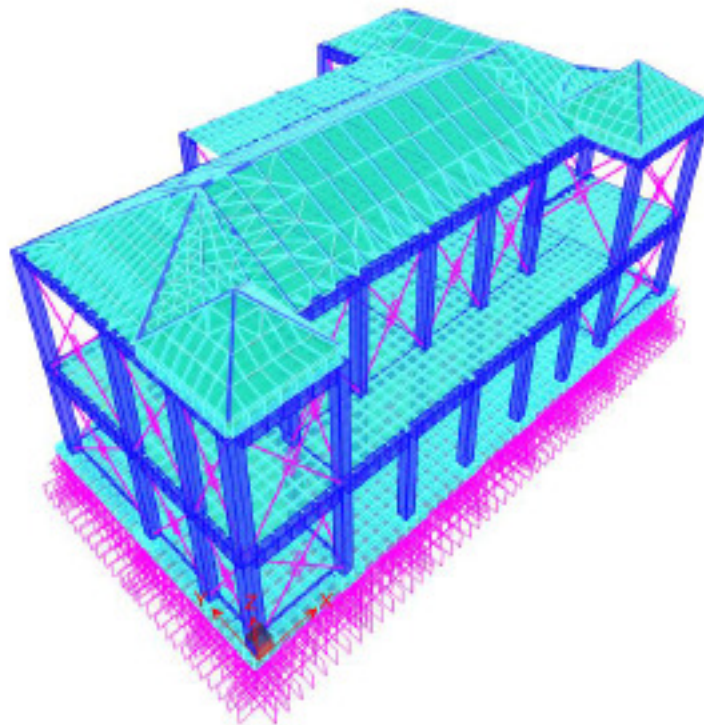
3-D representation of the City Hall building with the diagonal struts representing the masonry infills in place for the ground floor as well as for the 1st story.
